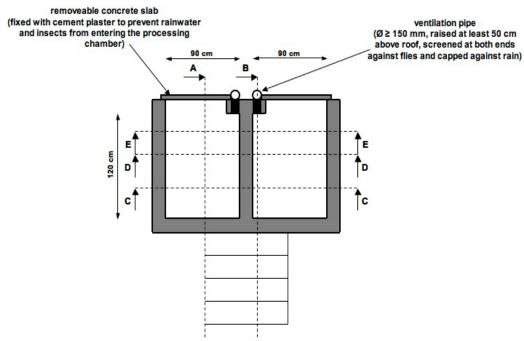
Conceptual sketch of individual UDD-Toilet (horizontal cross section)
